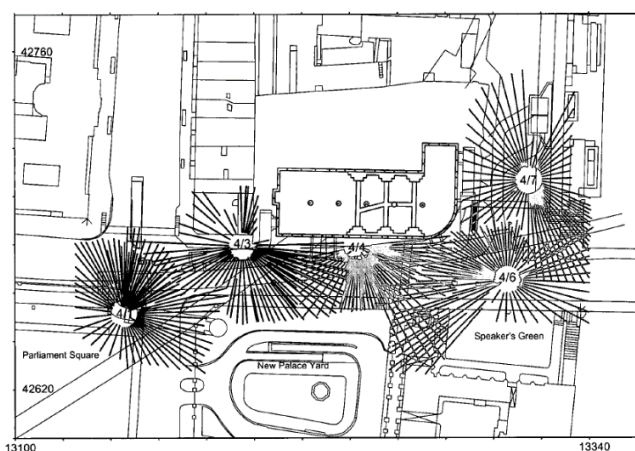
Plan view showing JLE Westminster station, grouting shafts and tubes-à-manchette arrays (Harris, 2001).
